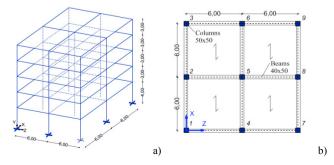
Geometrical dimensions of the case study structure: (a) 3D frame view; (b) dimensions in plan.
